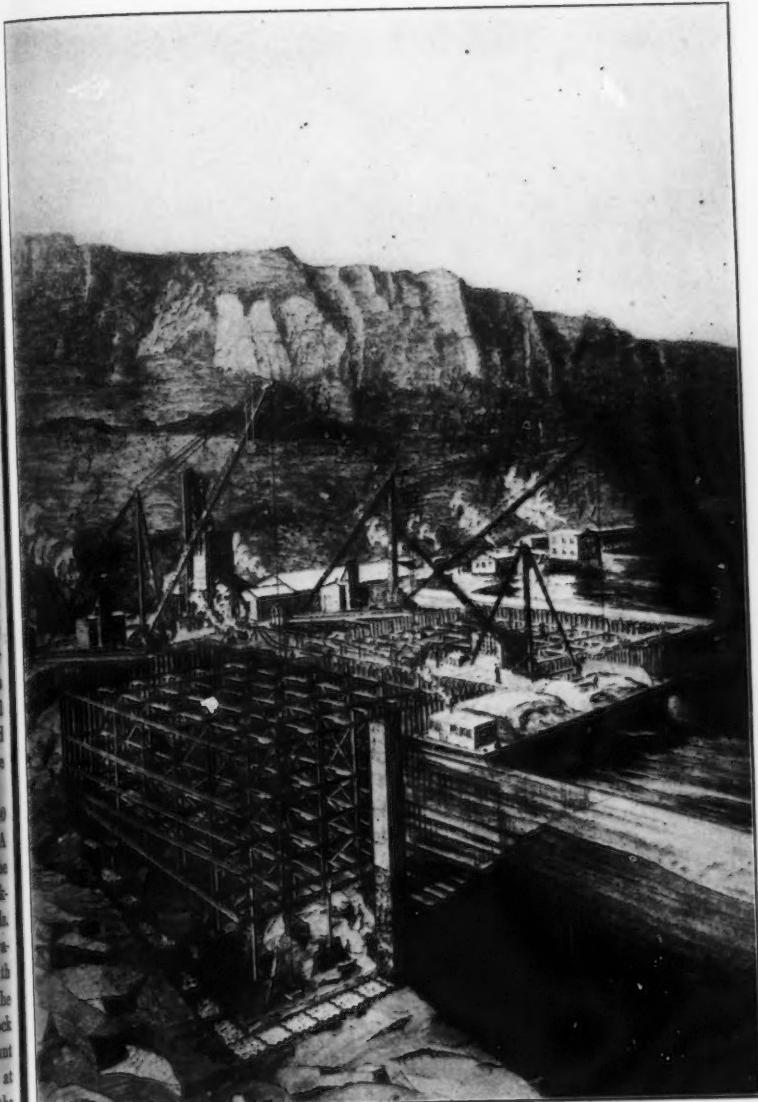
PERSPECTIVE OF COFFER-DAMS FOR NEW JERSEY TOWER FOUNDATIONS.
